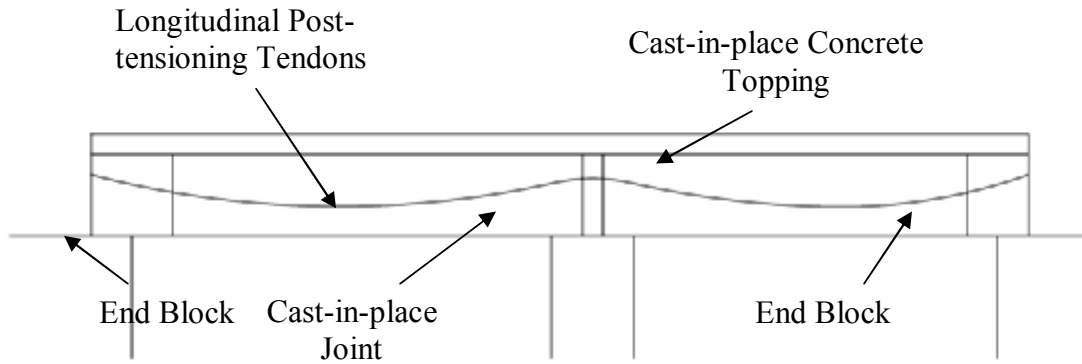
Elevation view of a bridge made continuous over the pier through the use of longitudinal post-tensioning (Saleh et al., 1995)
